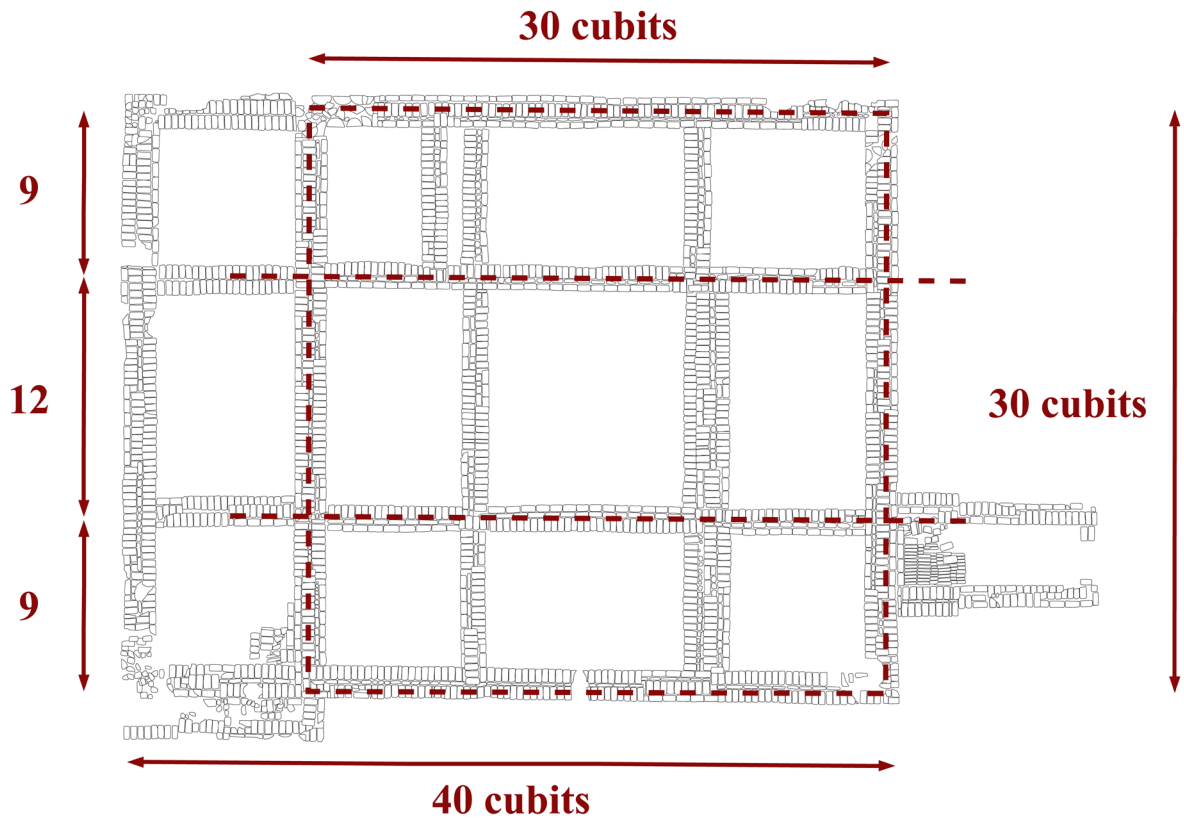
Sketch plan illustrating the probable use of the Egyptian royal cubit during the construction of Building E.
